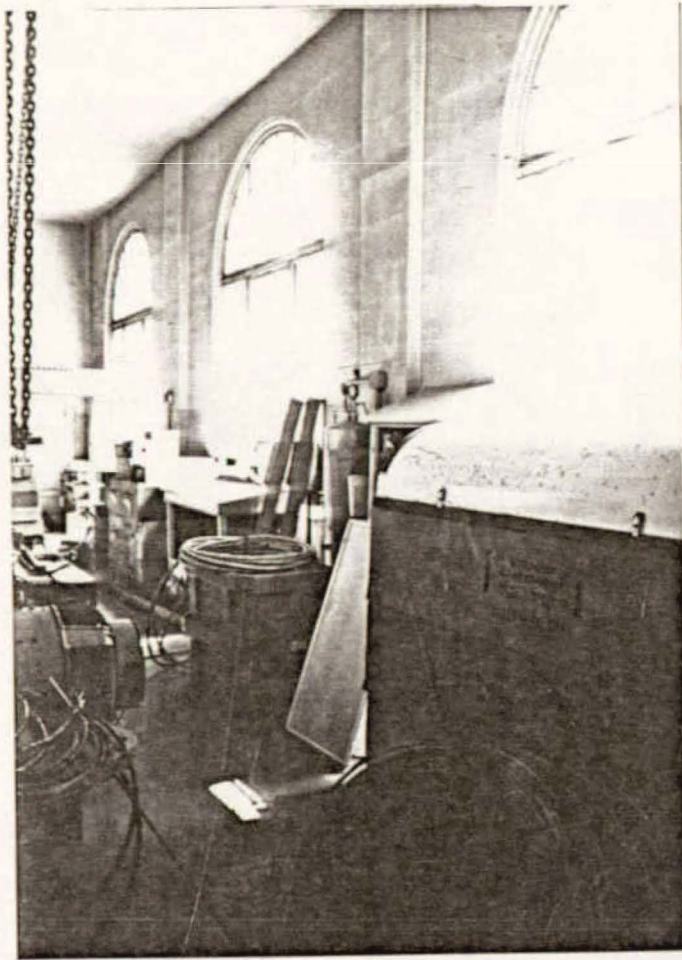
Looking southeast at the large windows on the south side of the building. The interior space and materials are in good condition.
